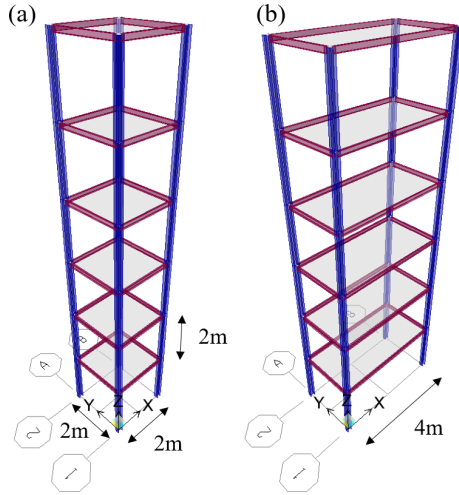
The numerical model of the two six-story steel buildings: (a) building I; (b) building II
